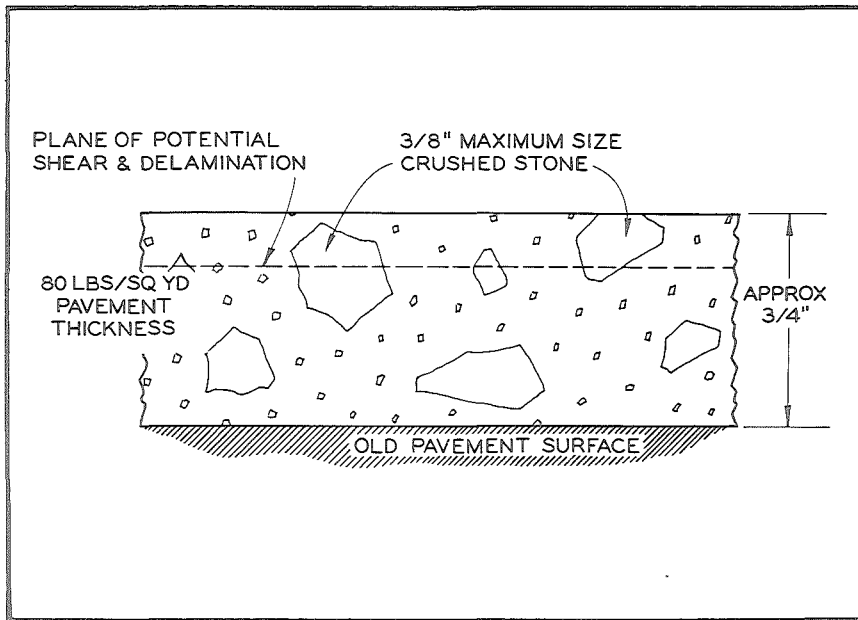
Cross-section of stone-filled sand-asphalt surface.
